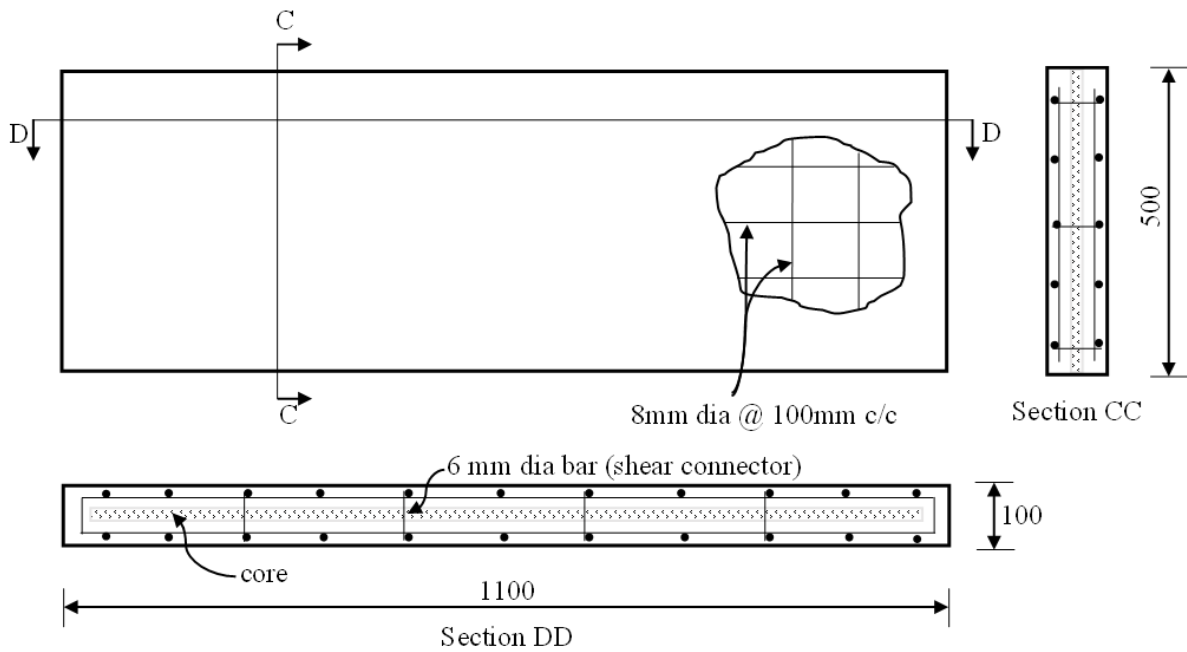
Details of precast concrete sandwich panel (All dimensions are in mm)
